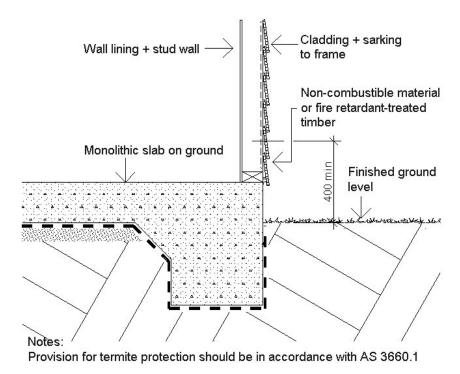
Wall cladding covering a slab-on-ground (extract for AS 3959-1999)
